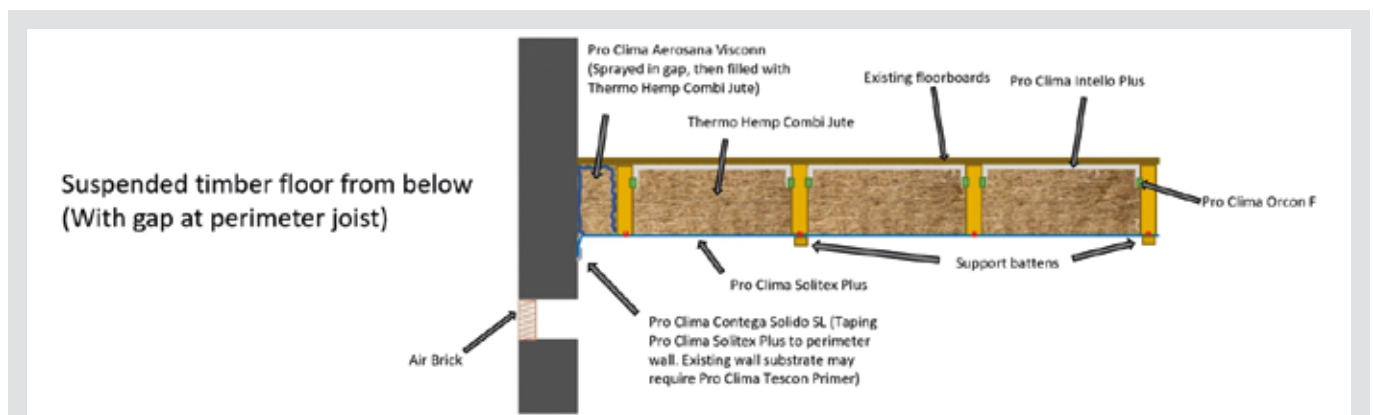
Suspended timber floor with gap between joist and perimeter wall
